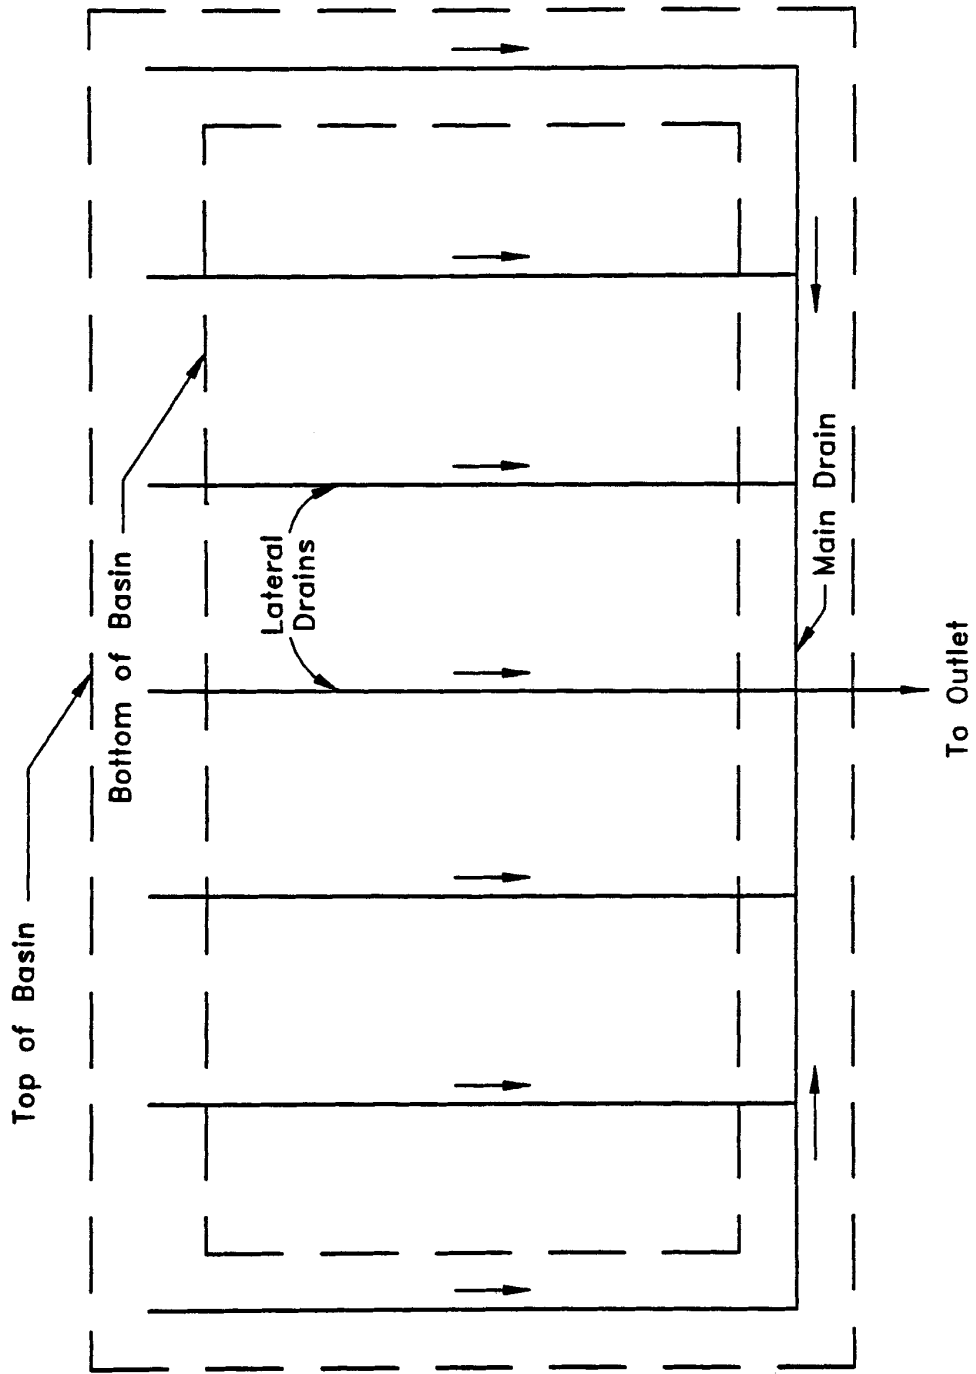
Plan view of typical underdrain system (N.T.S.).
